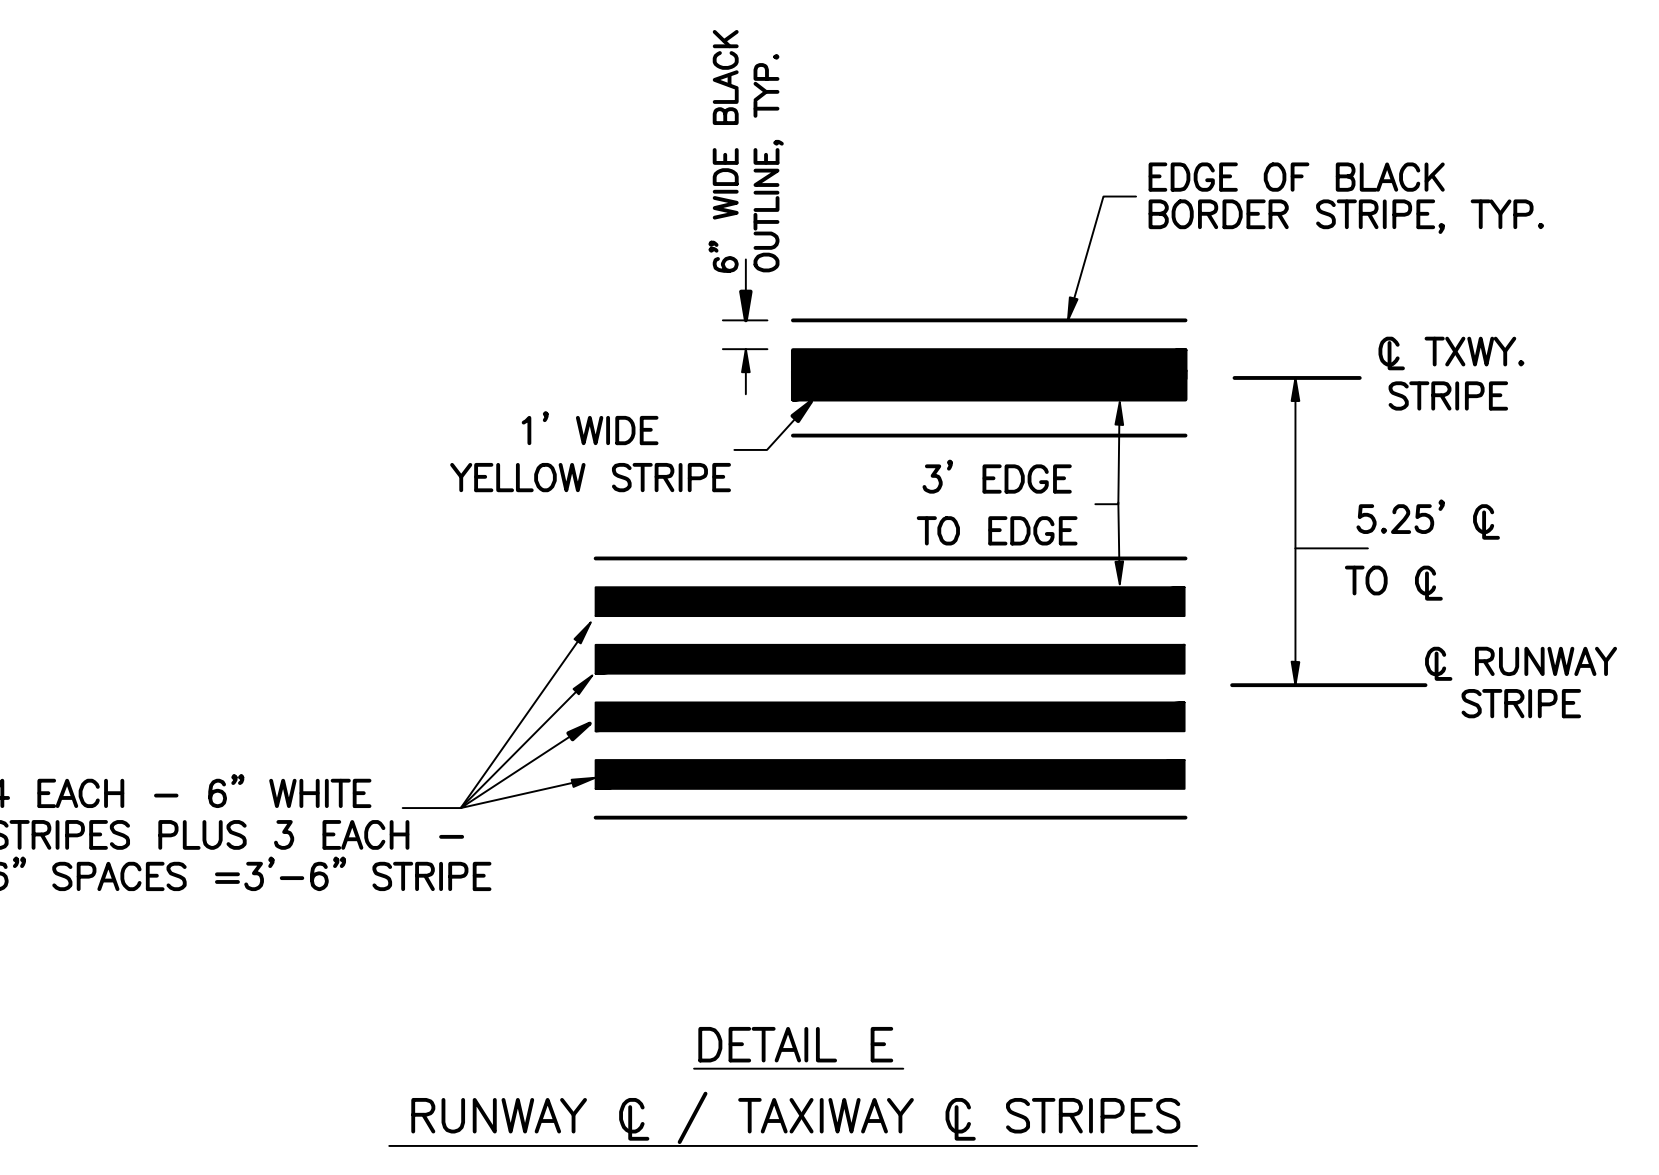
DETAIL OF INNER STRIPES THAT ARE PARALLEL TO CENTERLINE
